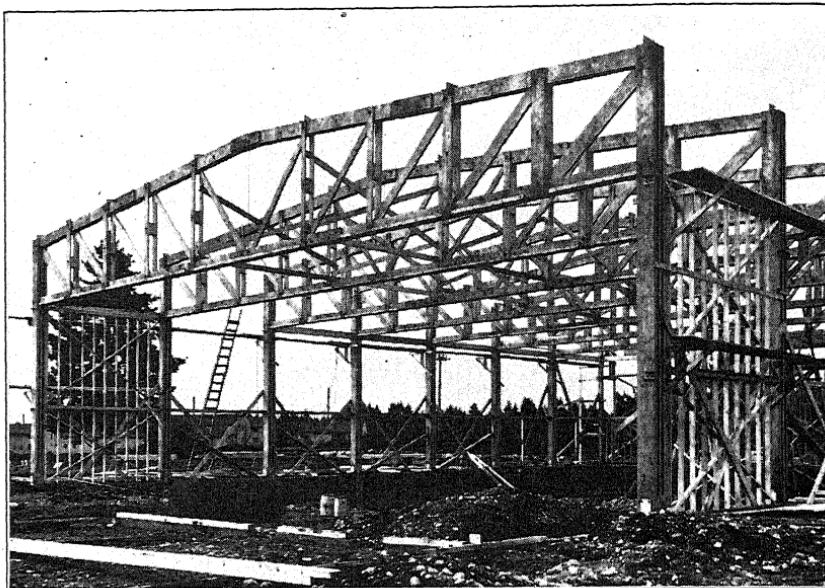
75-ft. Pratt trusses with spaced columns made an integral part of the truss.
